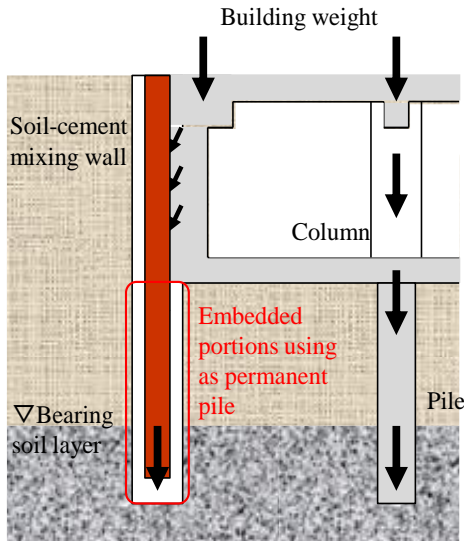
Schematic view of soil-cement mixing wall using permanent pile.
